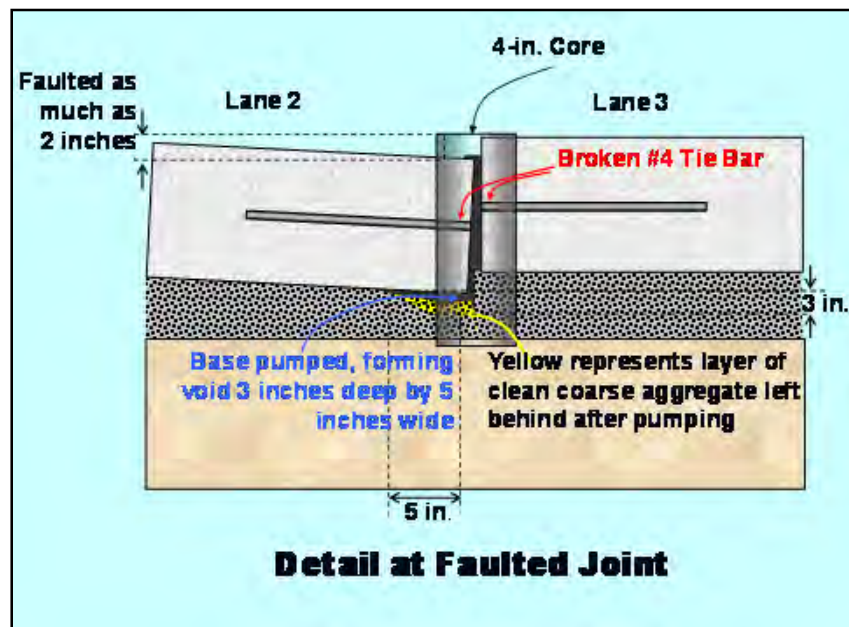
shows a section through the pavement along the longitudinal construction joint. This condition was observed where faulting was the greatest. A core was taken at the joint and the base material was observed. The construction joint had allowed water to penetrate to the base and pumping began to occur from the faulted slab in Lane 2. This pumping of the slab is evident from the clean gravel (no fine materials) found at the base and the approximately 3 in. deep by 5 in. wide void detected under the Lane 2 slab (Figure 6.86).
